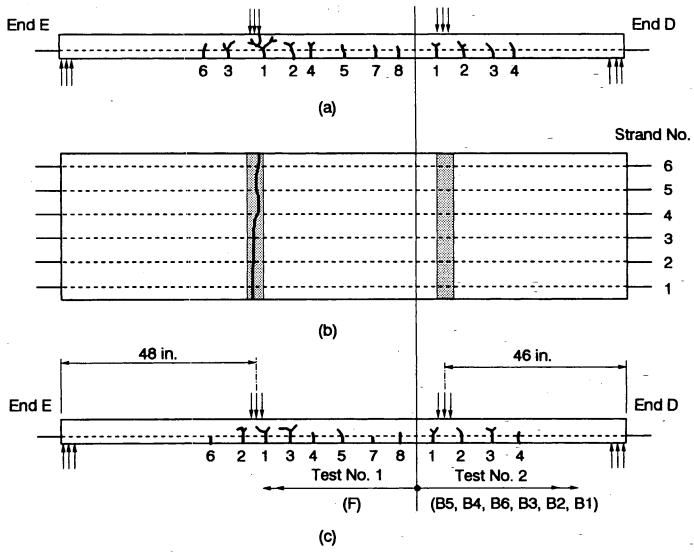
Crack patterns for D-type Specimen No. 15-6.0DU-3:
